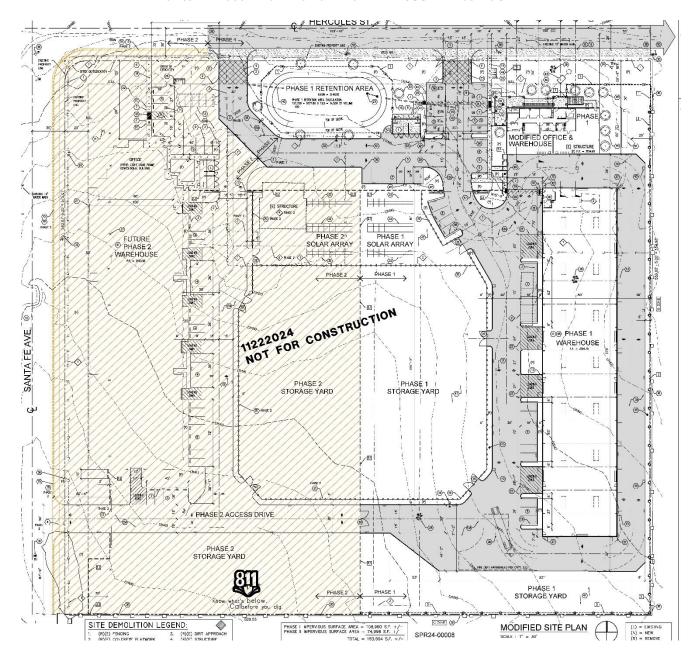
SITE PLAN OF PROJECT SITE SOURCE: RICHARD DESIGN ASSOCIATES, INC
